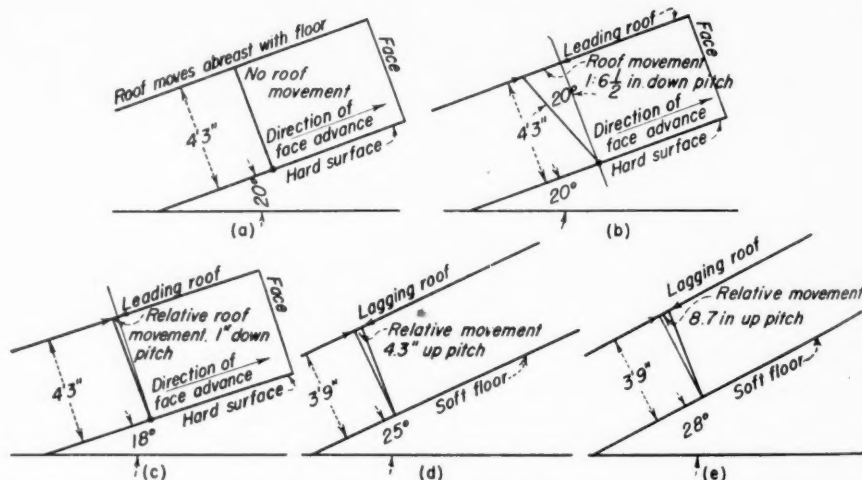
Illustrating how some roof moves down the pitch more, and some less, than the floor. When the part of the floor on which the prop actually rests is quite soft, the floor seems to outstrip the roof in its downward travel, and the foot of props slides down with it, just as a man's foot slides on a steep pitch with the soft or greasy surface on which it may happen to rest, and his head falls back and he has a spill. With a hard floor he has a better footing, as also does the post.
